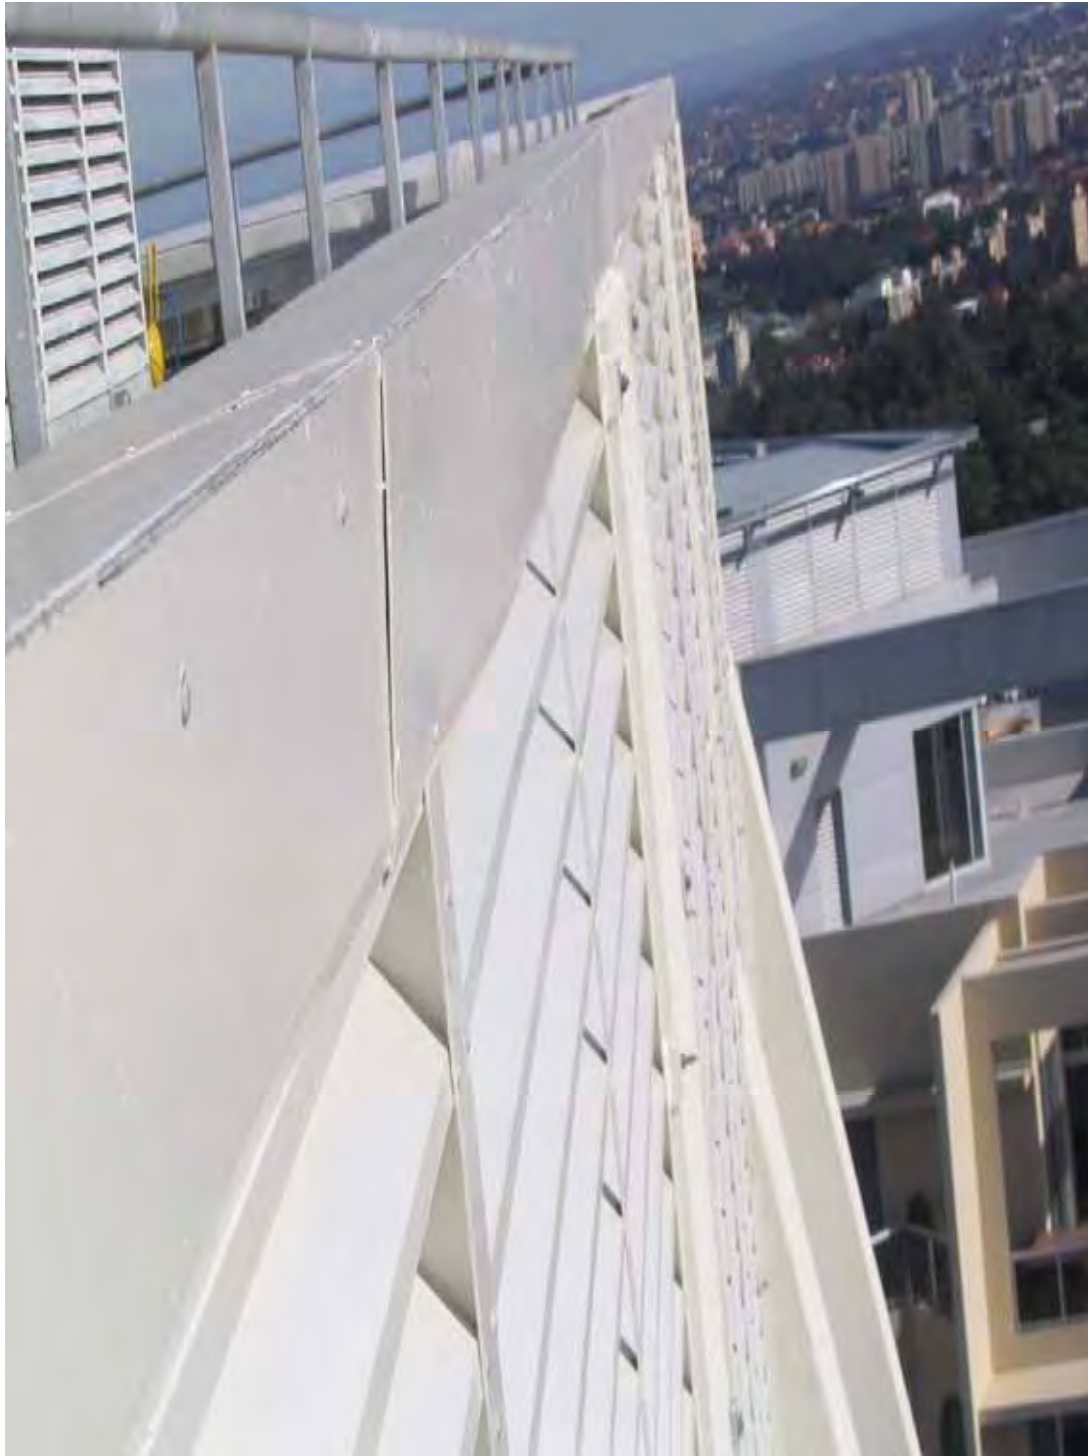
Cladding secured over louvres and mullions, riveted to mullion section around parapet; cladding sits over louvre face on façade.
